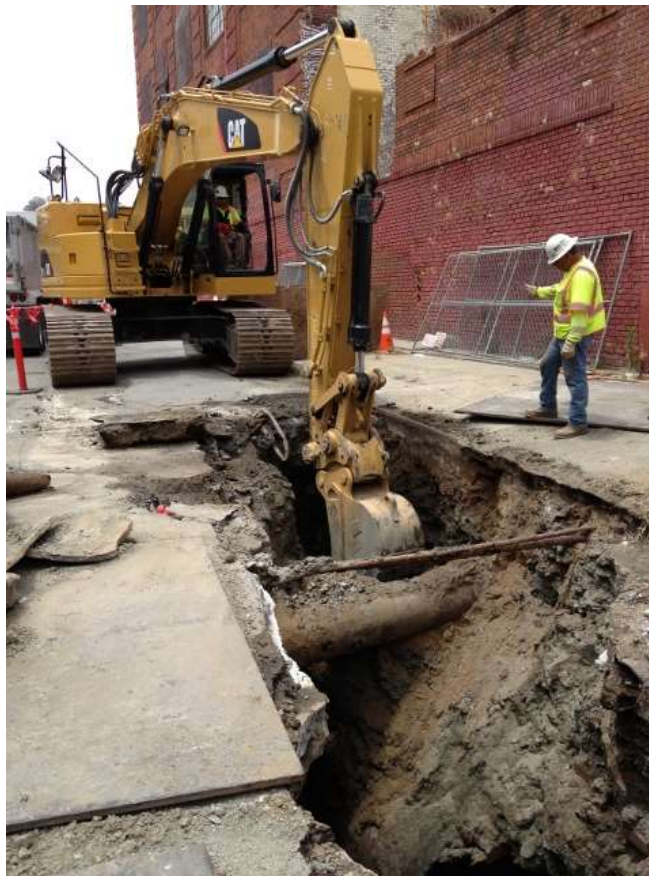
Excavating duct bank on 23rd Street. View west, June 22, 2015.
